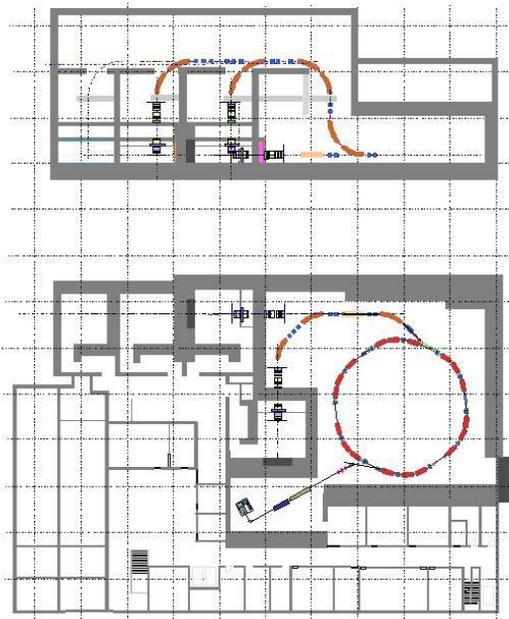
Layout of new carbon-therapy facility at Gunma University.
